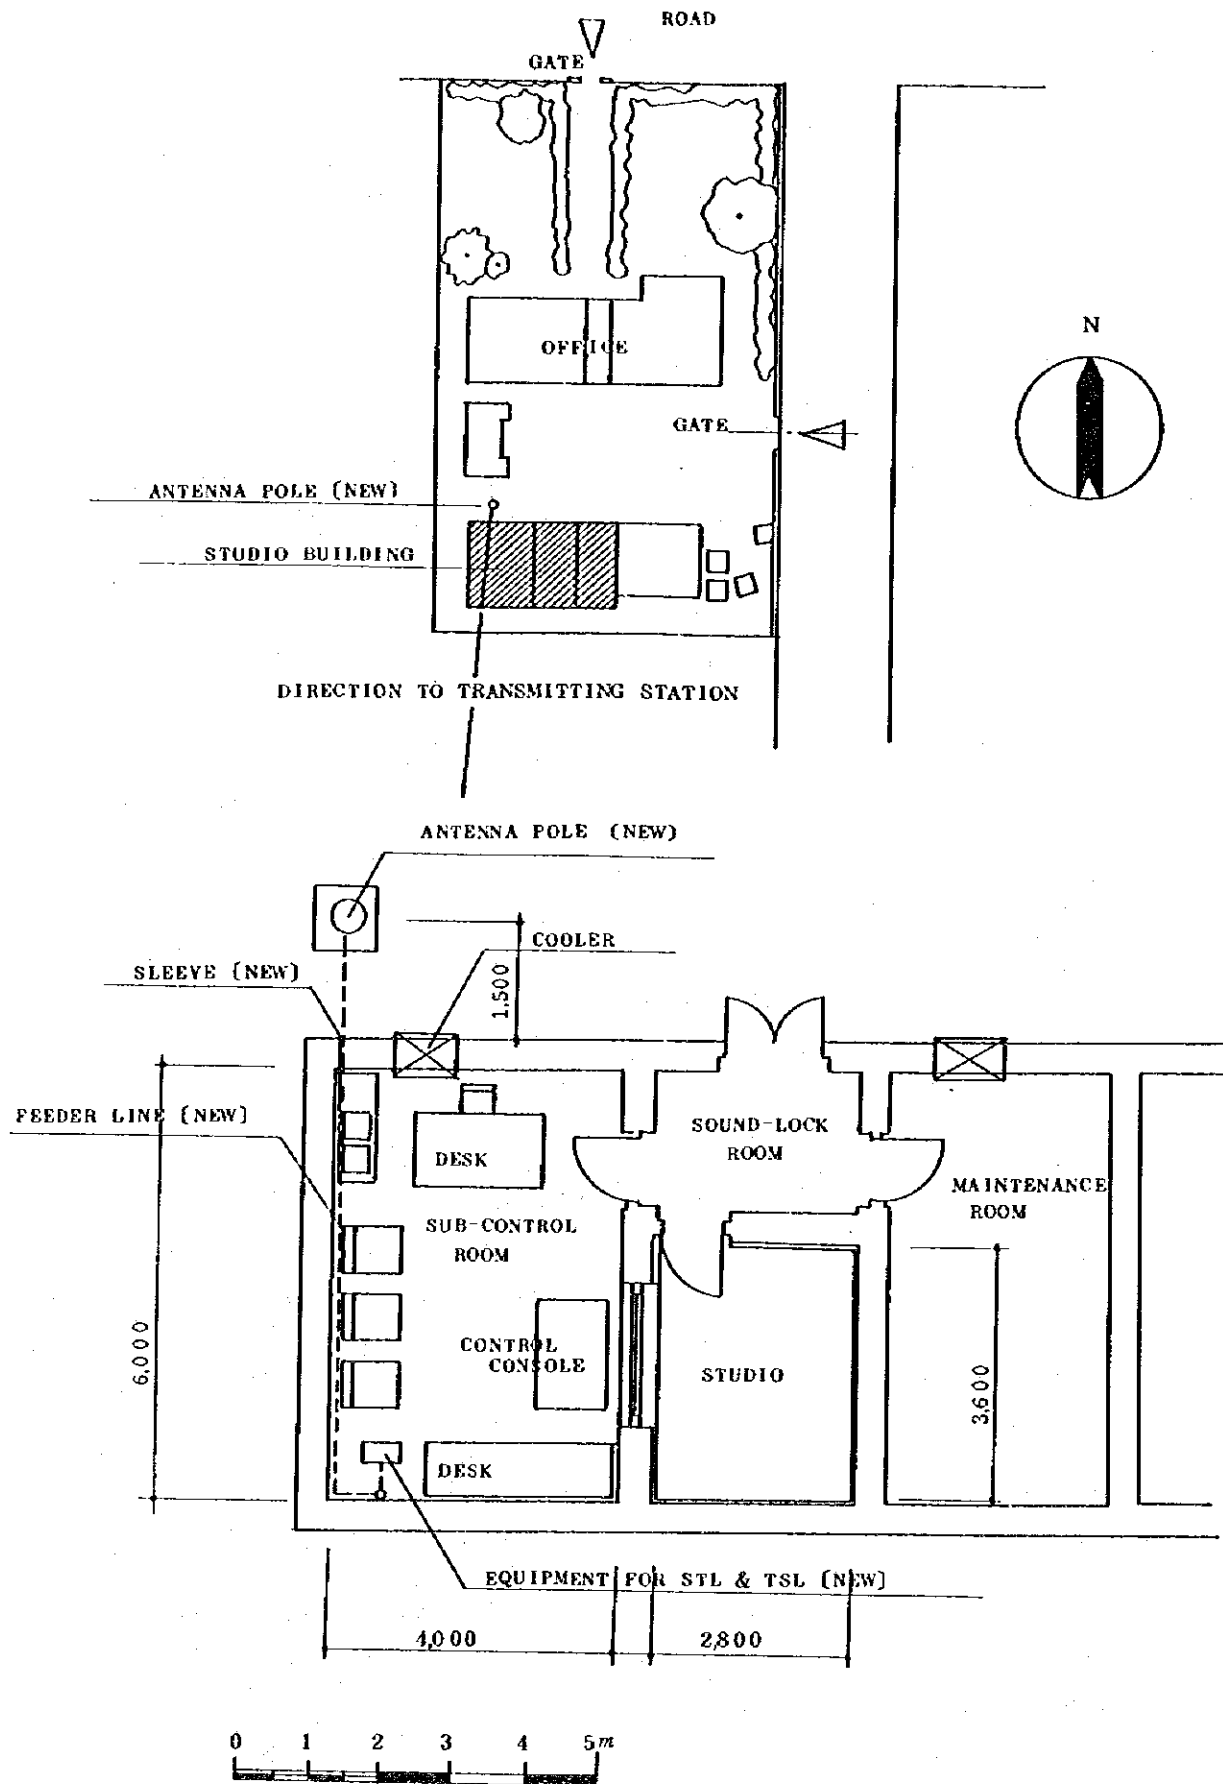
Layout of Equipment and Other Facilities (Atbara)
